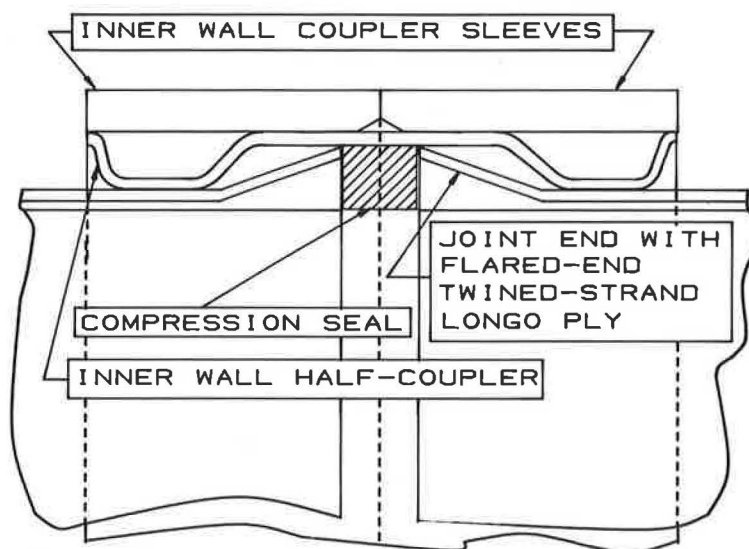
Enlargement of section view of tunnel joint seal and coupler.
